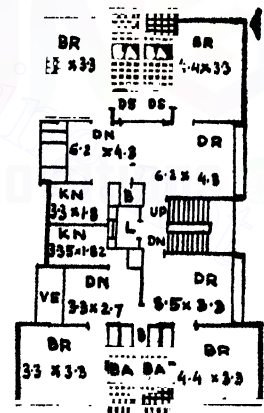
TWO-2 BED ROOMED FLATS PER FLOOR MULTI STORIED BUILDING.
